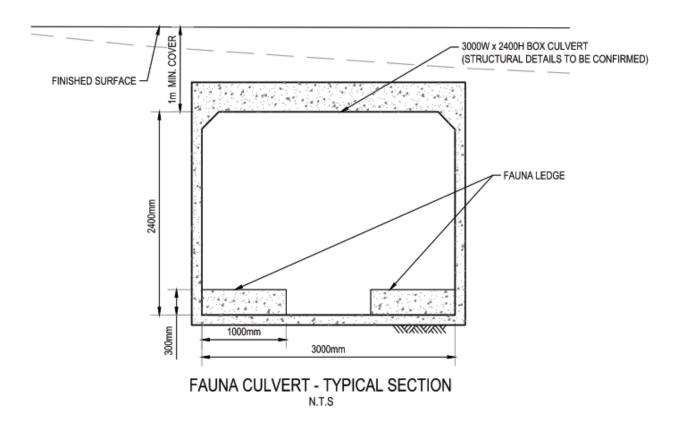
Cross section of the proposed culvert at Surveyors Creek
